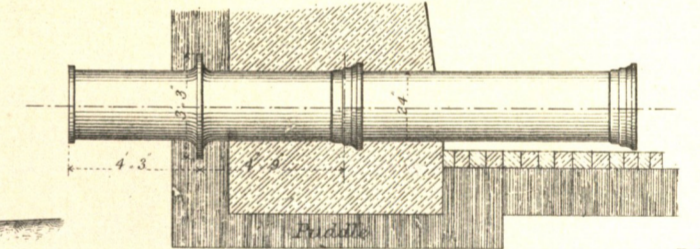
Overflow and Cleansing Pipe Cooling Pond
